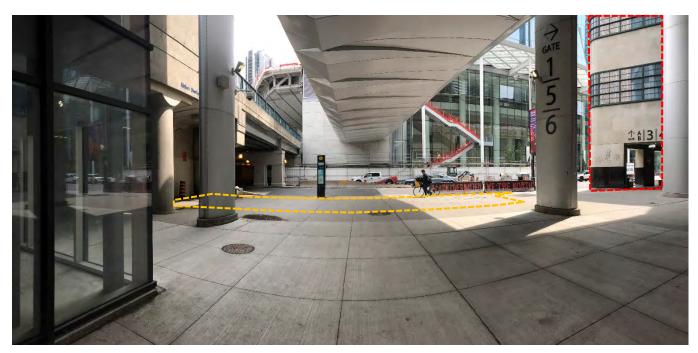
Approximate area of proposed intervention within 40 Bay Street (outlined in an orange dashed line). Note the historical façade of the Postal Delivery Building on the right (outlined in red dashed line).
